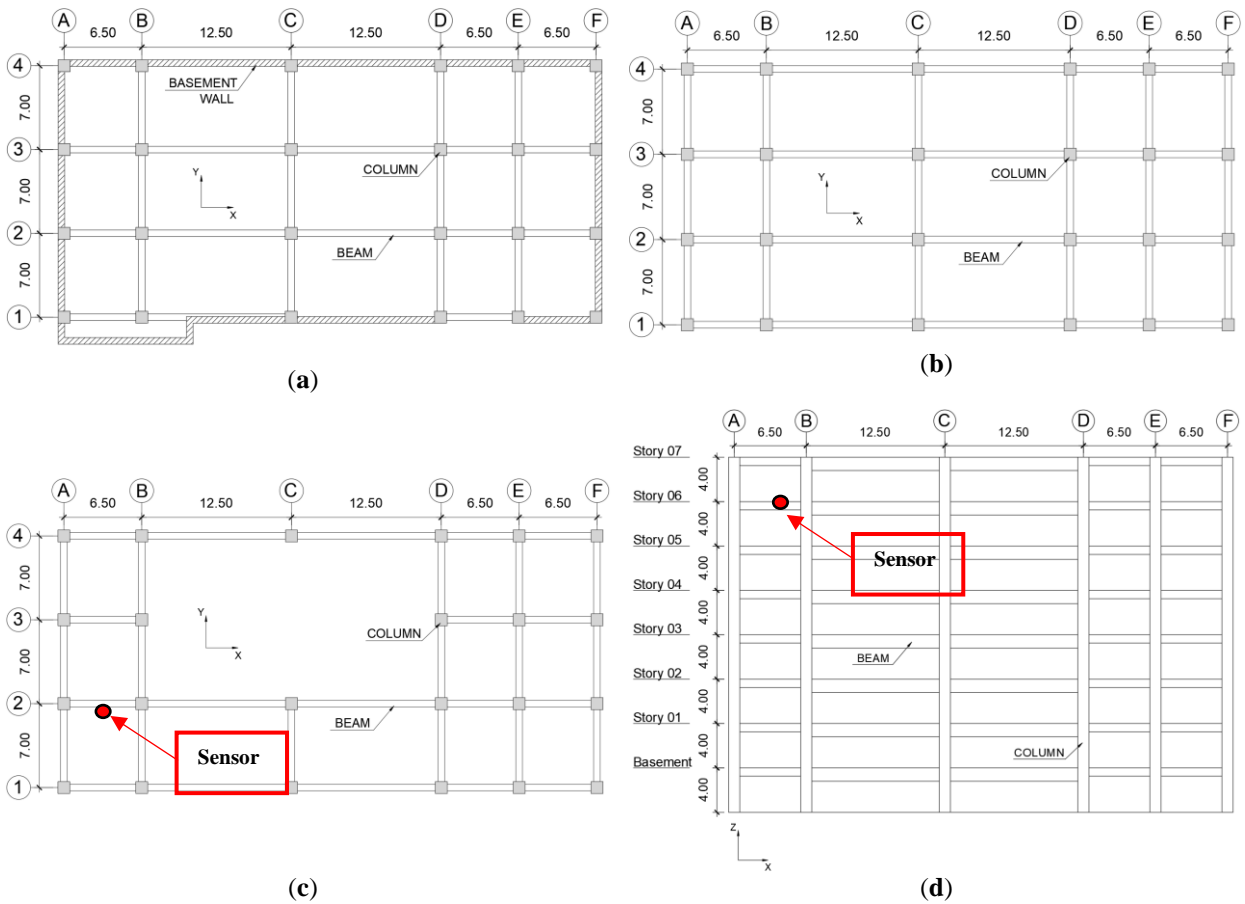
General drawings of Toyohashi Fire Station building. (a) Plan of basement view. (b) Plan from 1st to 6th story view. (c) Plan of 7th story view. (d) Elevation of X-direction view.
